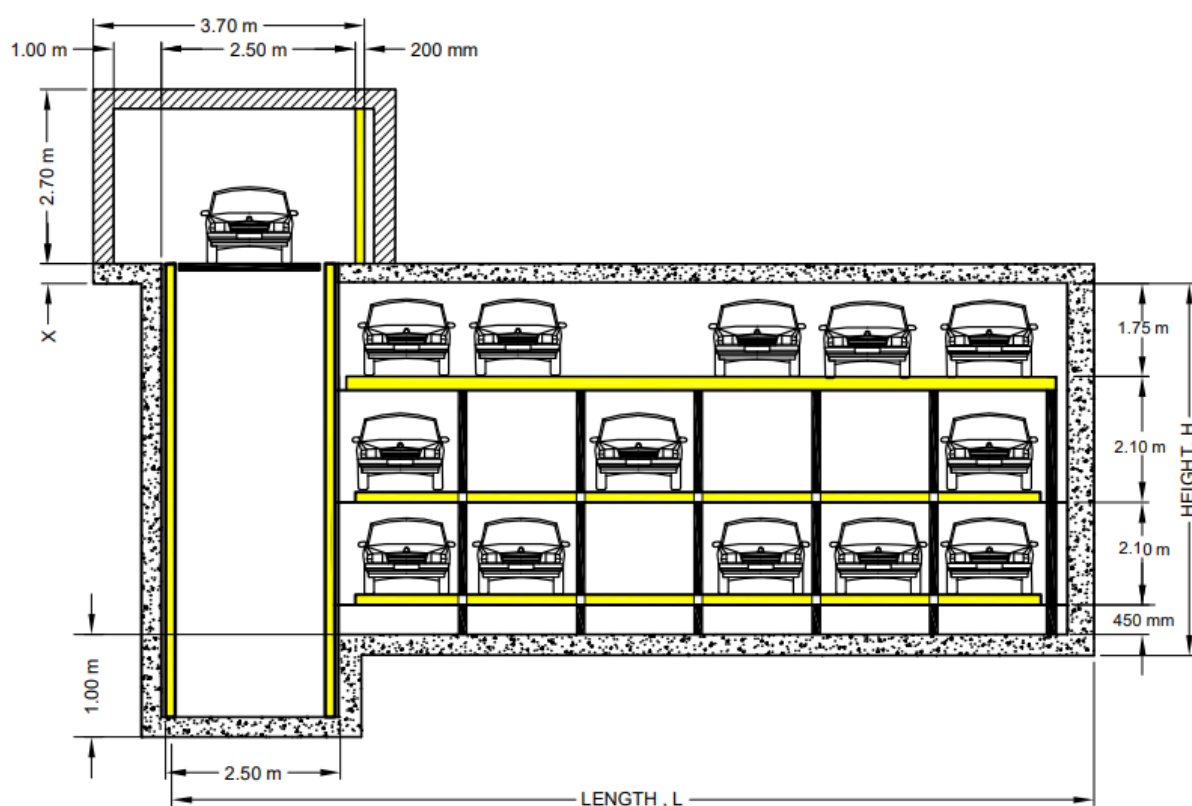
CROSS SECTION SHOWING LIFT MOVEMENT AND PLATFORMS ARRANGEMENT
